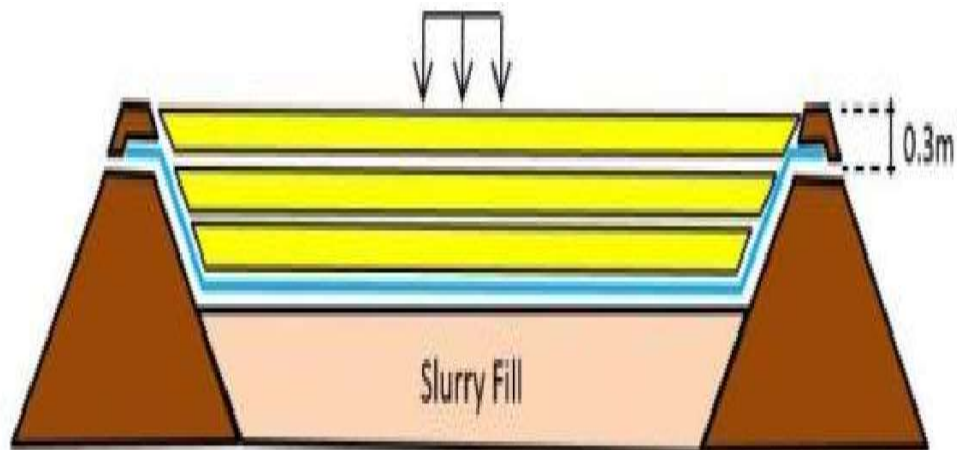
Cross section of the confinement facility with geotextiles-sand working platform
